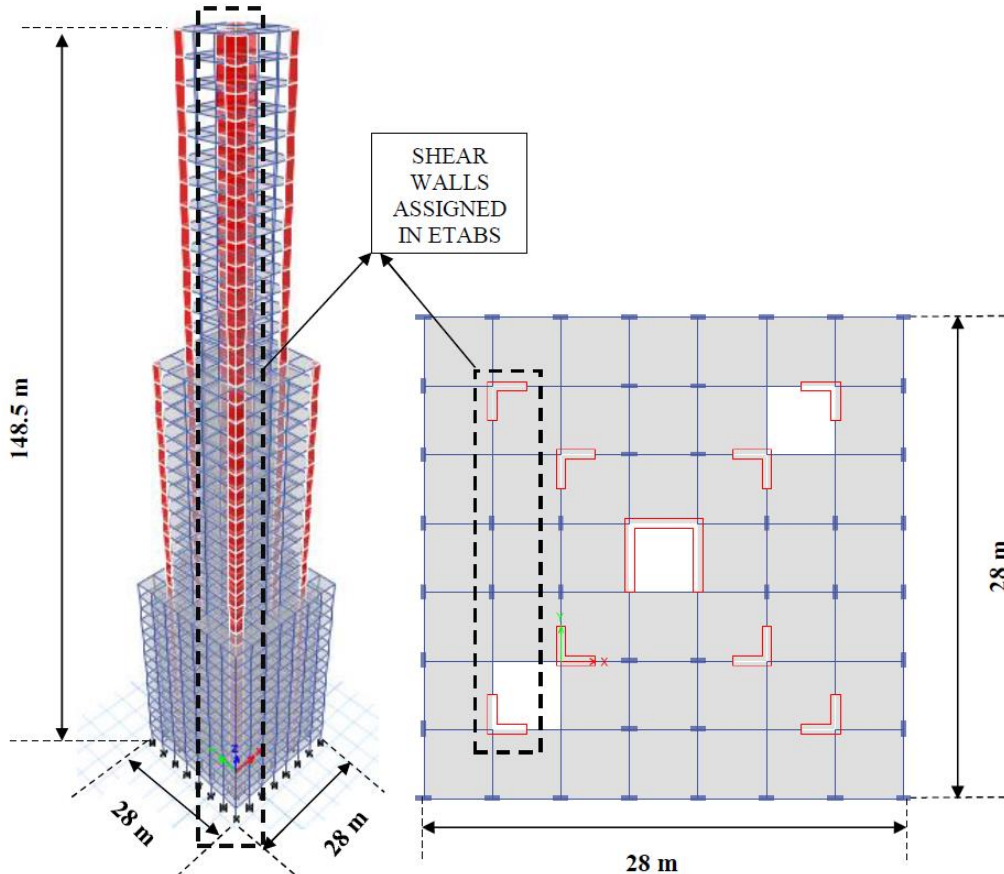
3D and base plan view of typical G+45 bundled tube high-rise building considered in the study (A1)
